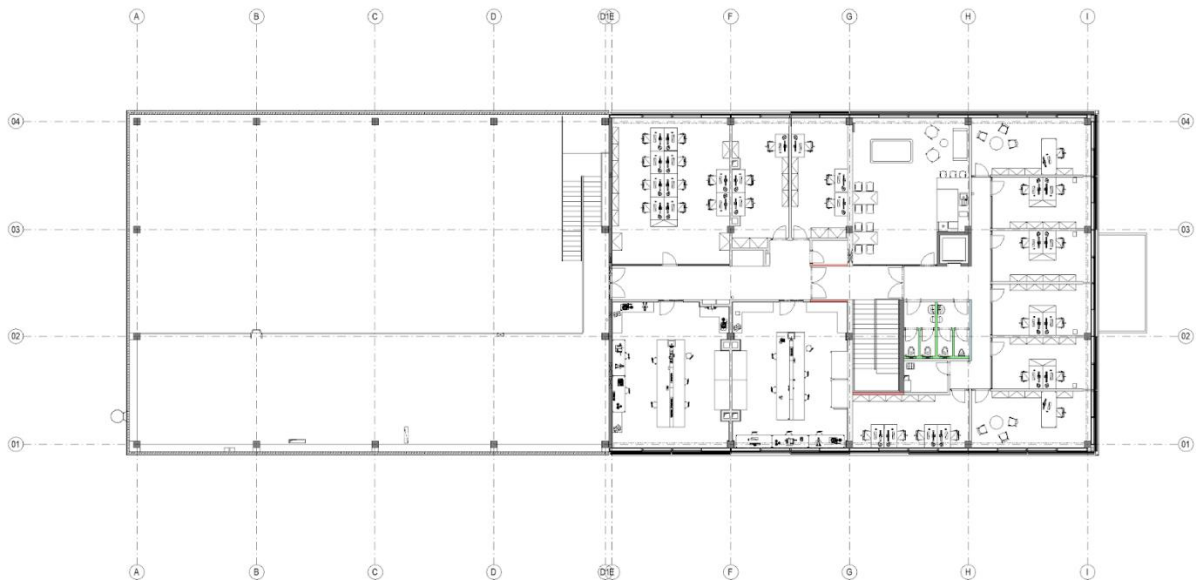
The traditional drawing of a floor plan made in scale 1:100
